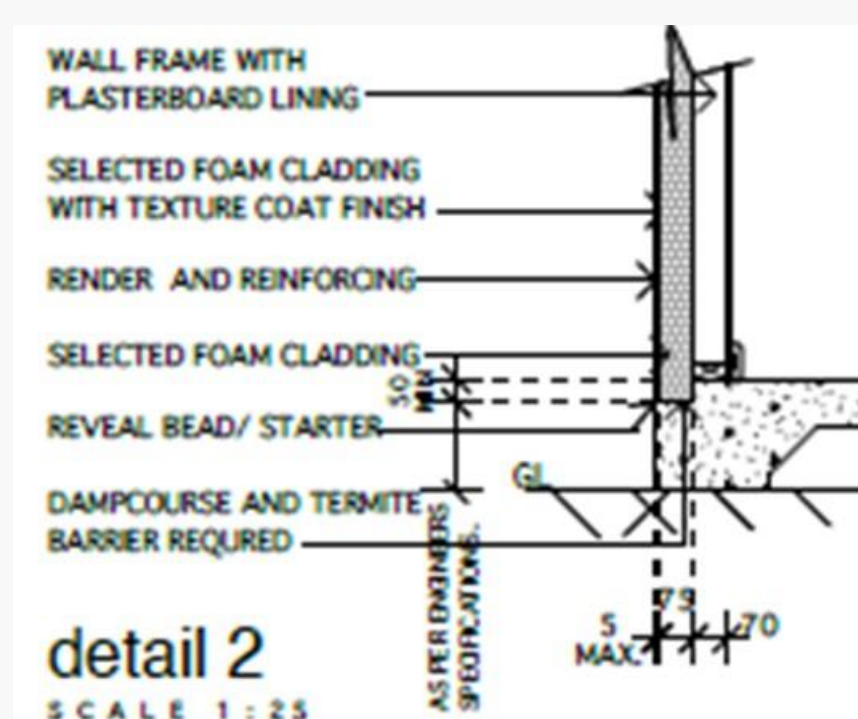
A drawing of the cross-section of the outer wall other than the front wall
